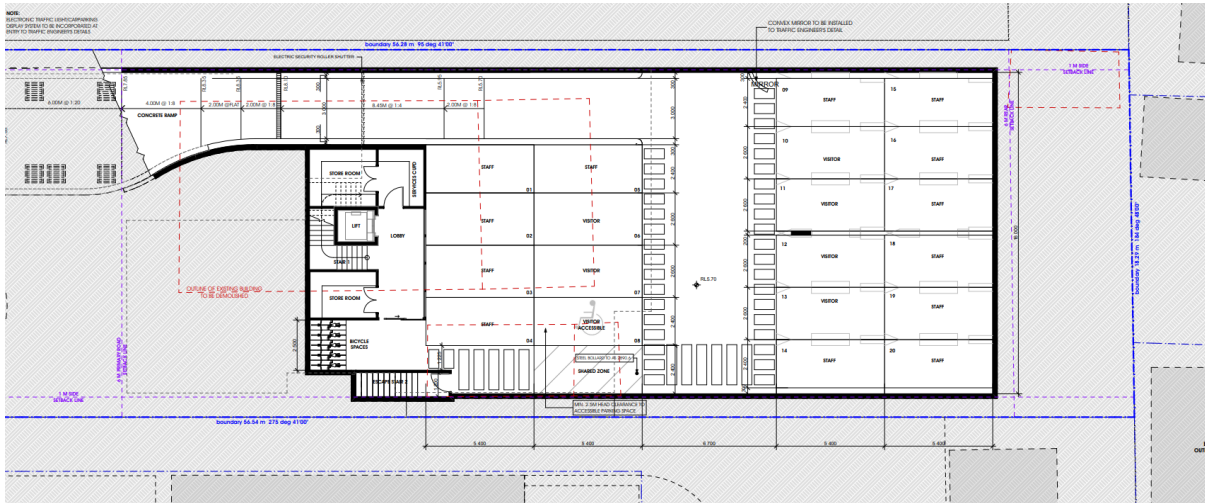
Extract of proposed basement level (Source: Design Building Group, 2023).
